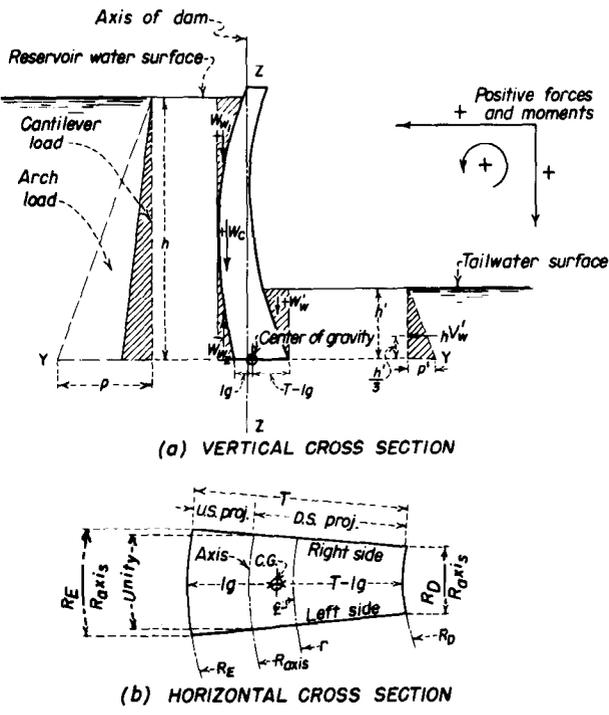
Cross section of a radial-side cantilever showing normal loading conditions.—288-D-2973
